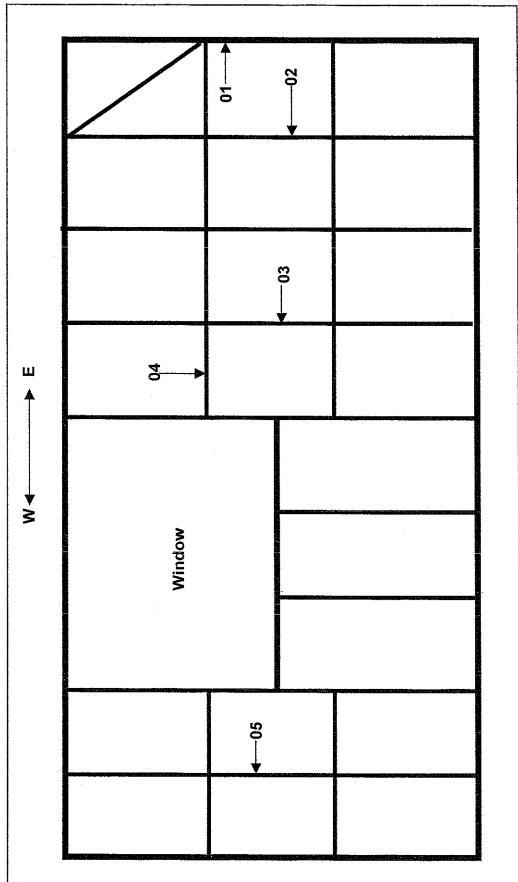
Simple schematic diagram to show position of sampled timbers West wall viewed from the east looking west Z Window ∀ 90
